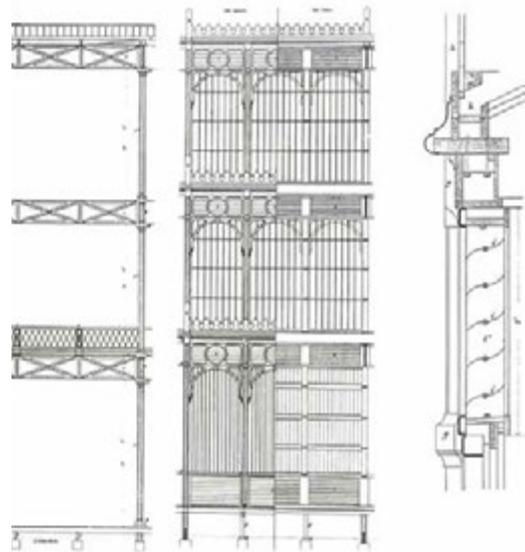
Facade Details (Schittich e.a. 2007 p.20)
